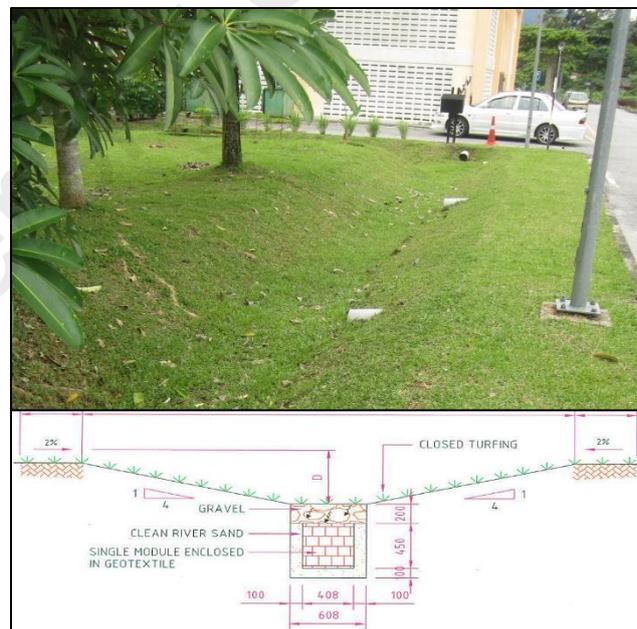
Design plan of constructed grass swale with on-line subsurface conveyance
